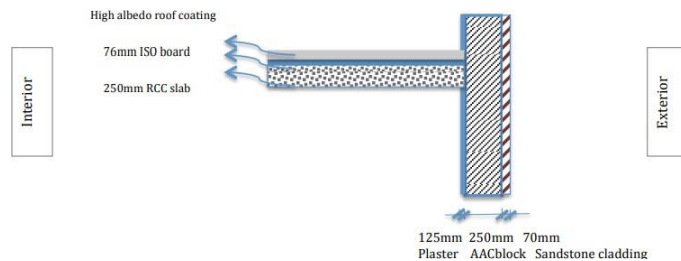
Cross section of wall and roof with low U-value assemblies at ITC Green Center, Gurgaon, source: escholarship.org
